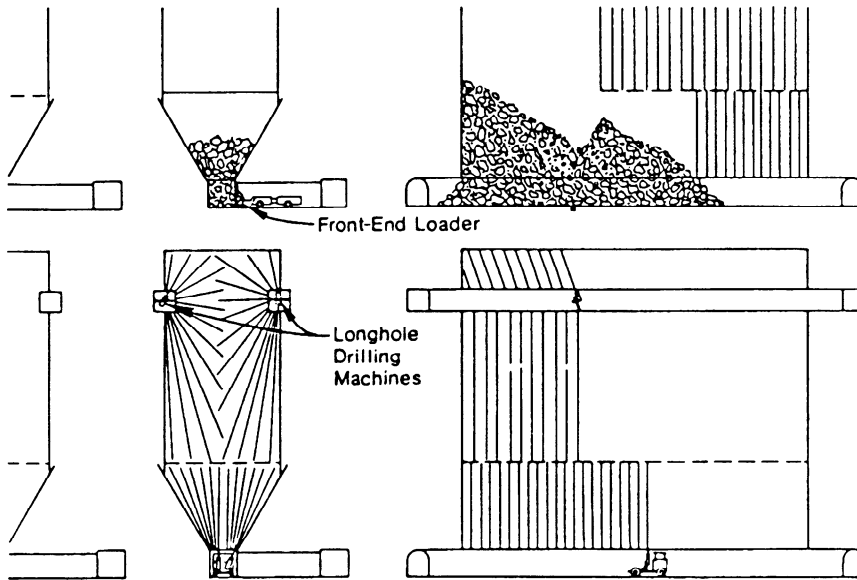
LHD drawpoint system of ore extraction (Irvine, 1982).
